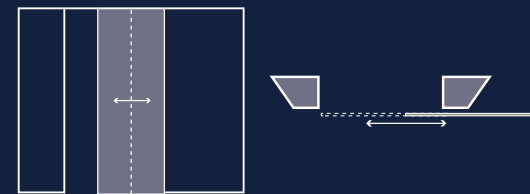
DETAILS OF VITRA EXTERNAL WALL SLIDING DOOR CLASSIC
